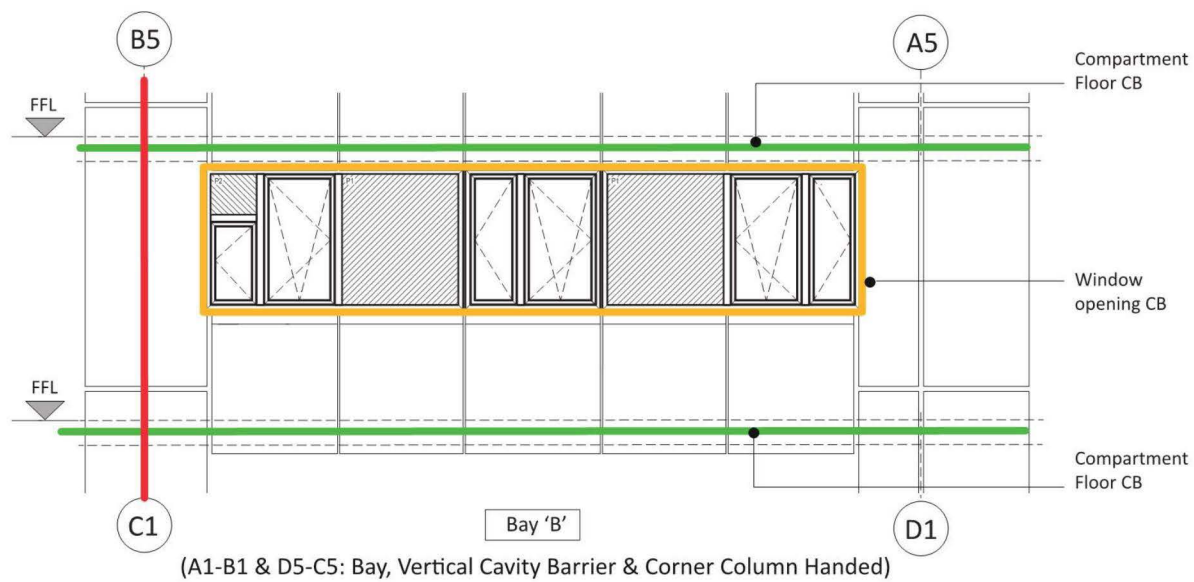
Typical elevation with examples of typical detail 1, 2 and 3 locations indicated
